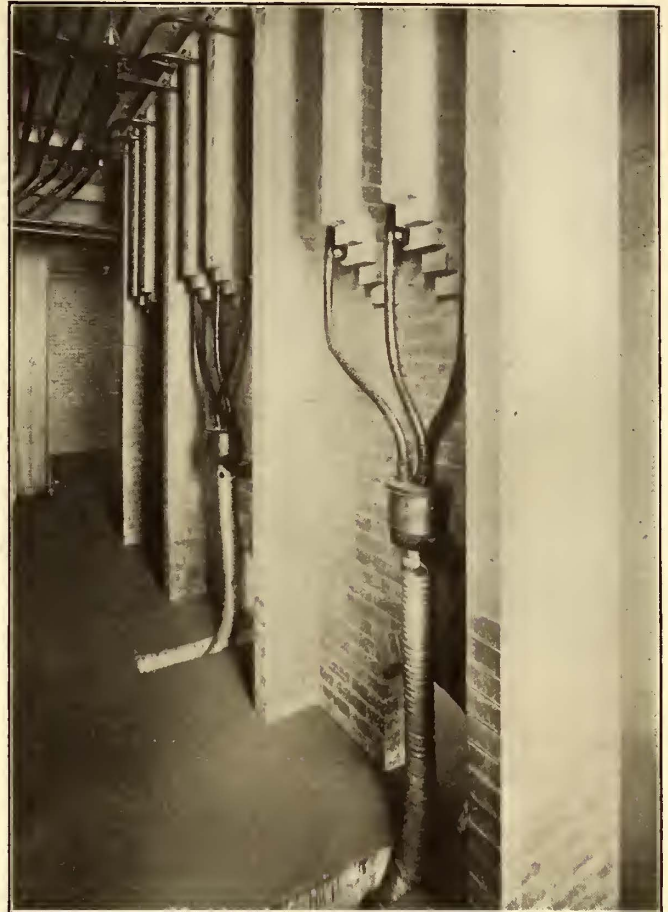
HIGH-TENSION FEEDER CABLES IN BASEMENT, ENTERING CONDUITS
